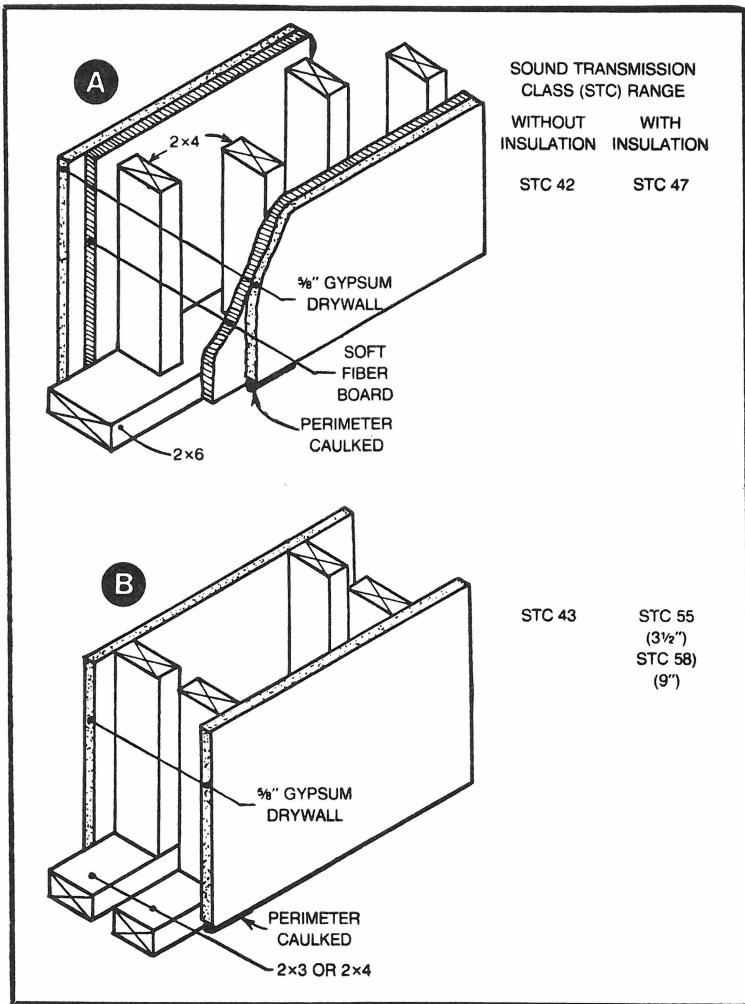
A comparison of wall constructions of (A) a staggered stud wall and (B) a double stud wall.
